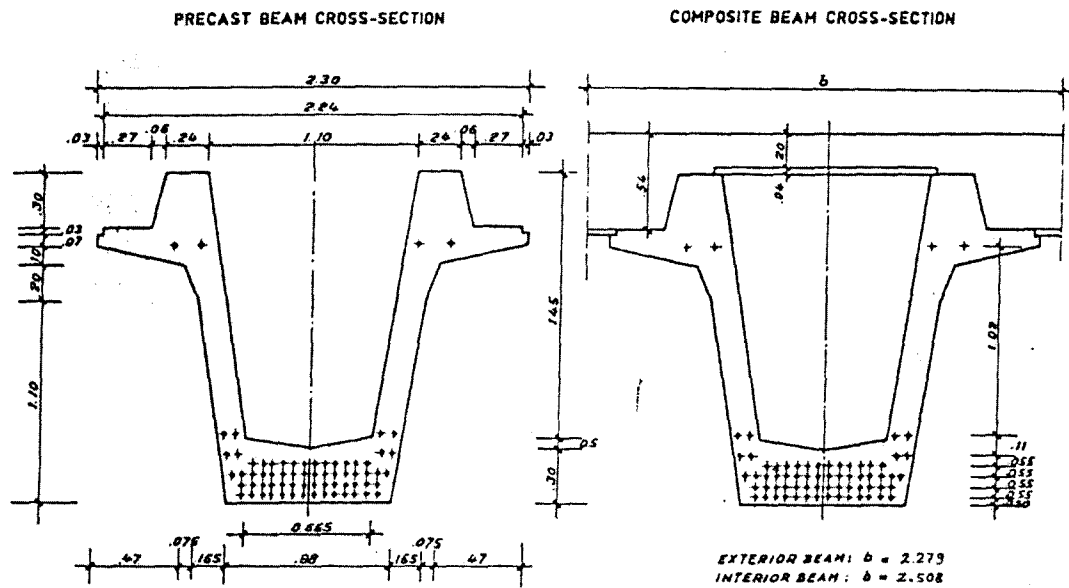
Typical Cross Section of the Girders (dimensions in meter)
